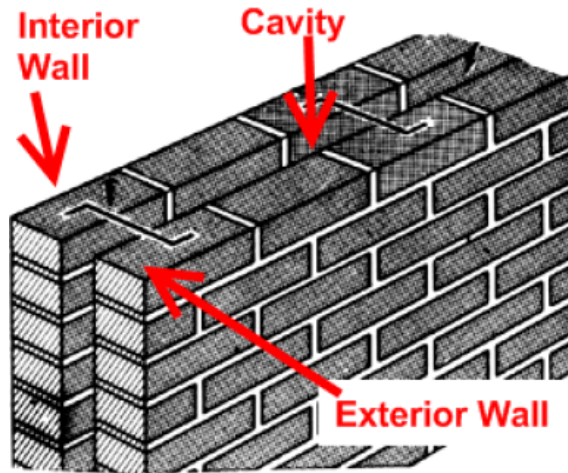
AS BUILT EXTERIOR MASONRY WALLS
